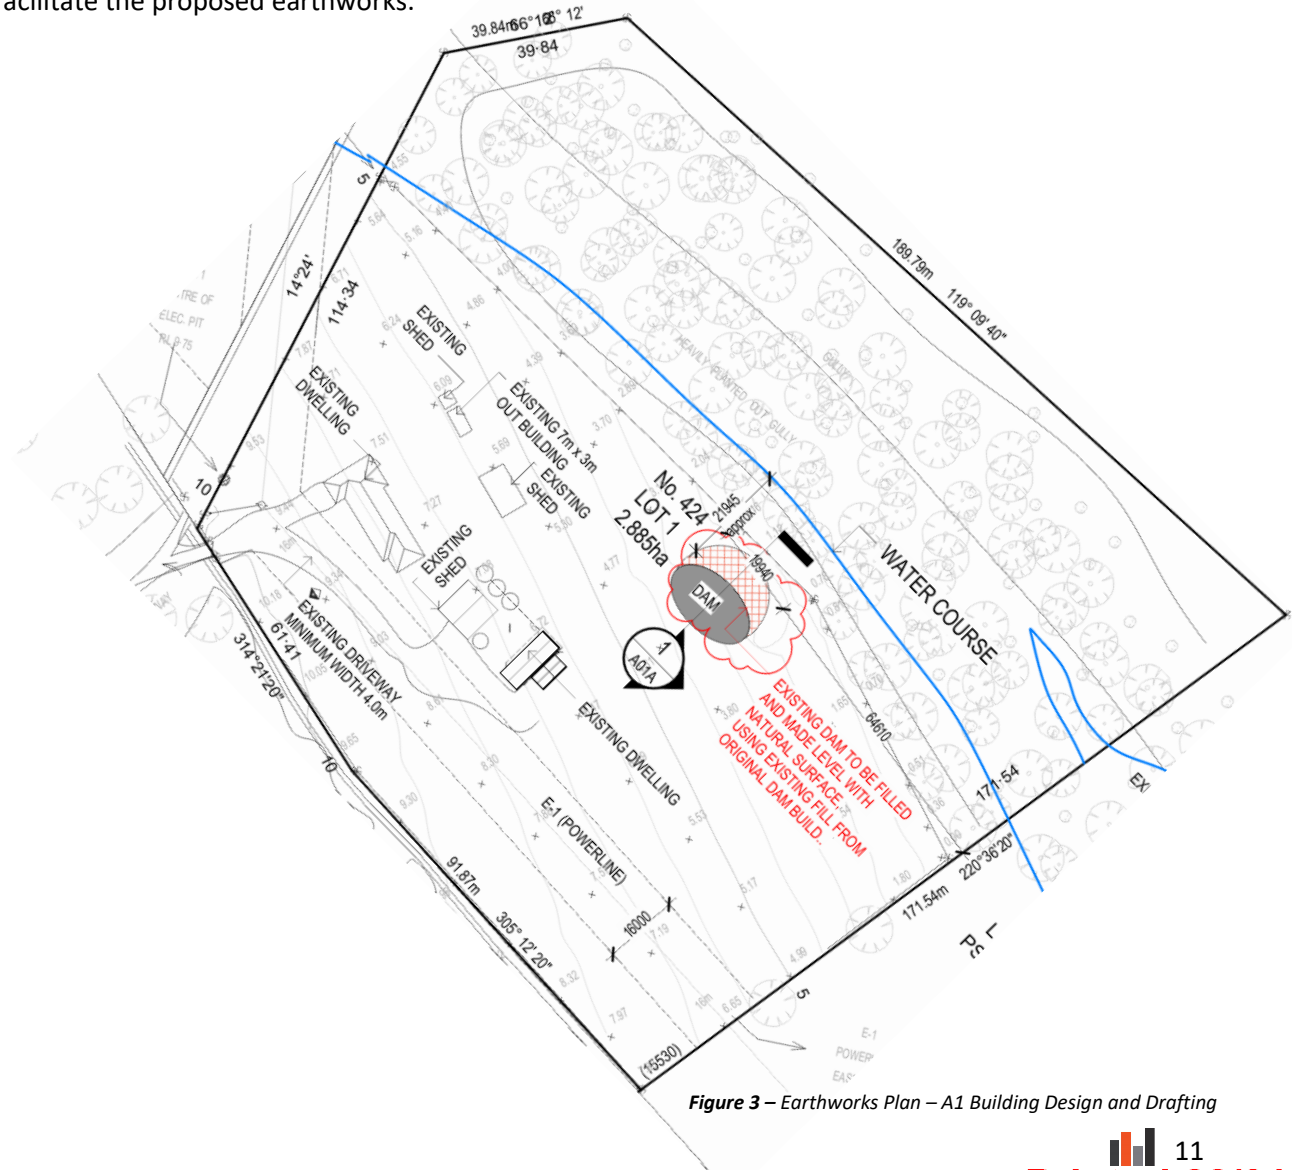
Earthworks Plan – A1 Building Design and Drafting
